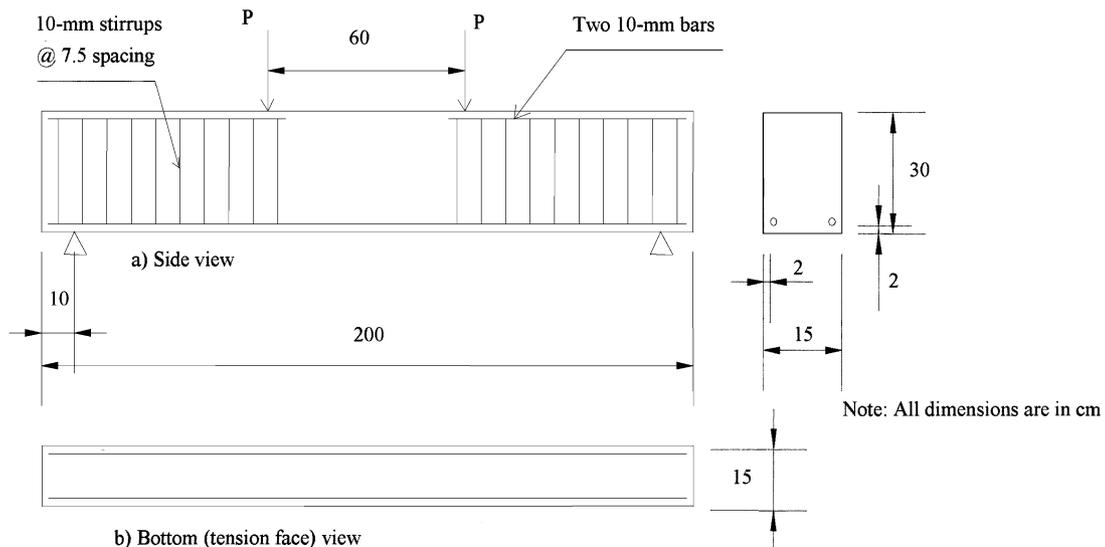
Longitudinal and cross-sectional details of beams F0 and F15 of set 1.
